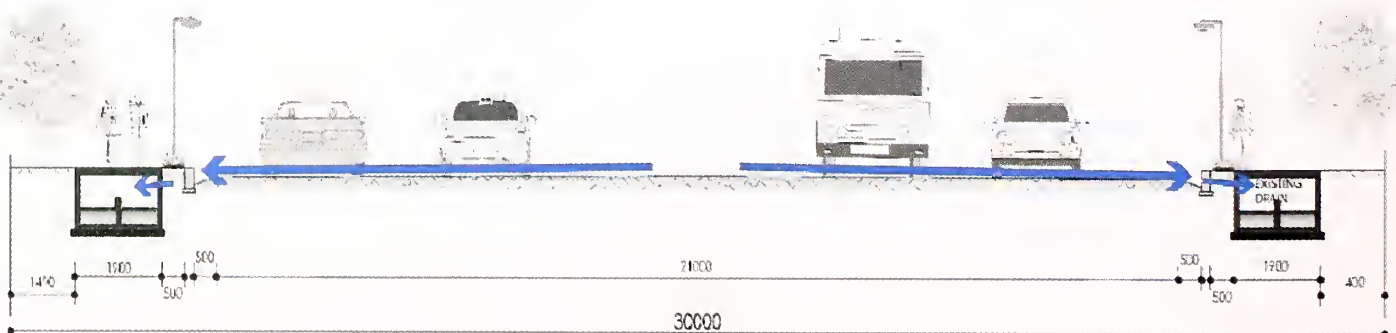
(a) Schematic Road Section for Retrofit of Existing Road
